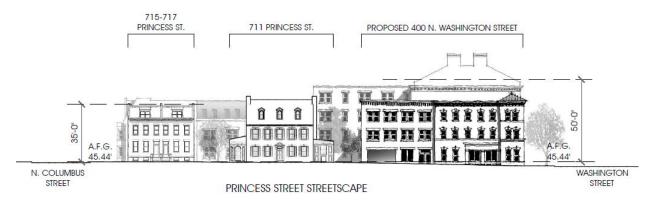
Proposed Princess Street elevation showing relationship of new construction with historic buildings.
